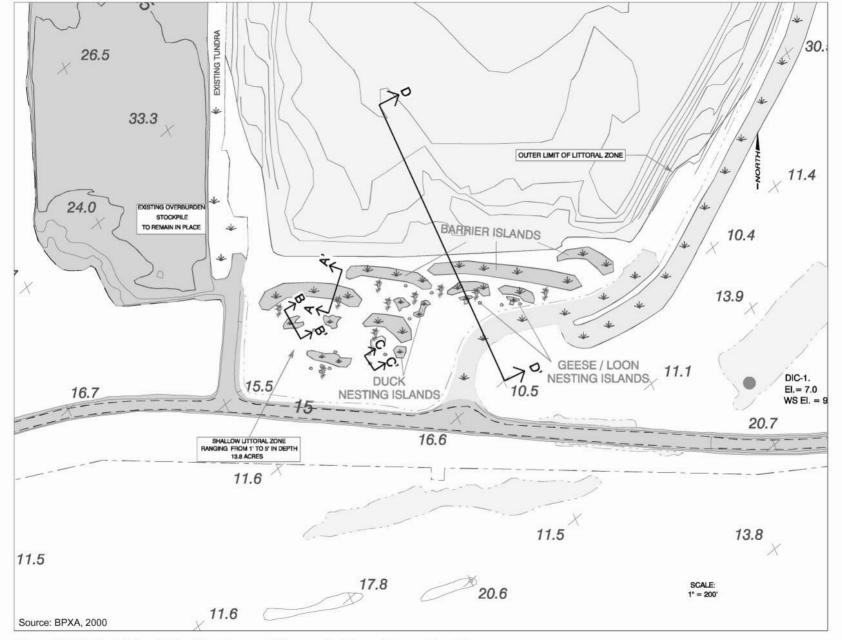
Duck Island Mine Site - Proposed Restoration Littoral Zone - Plan View
